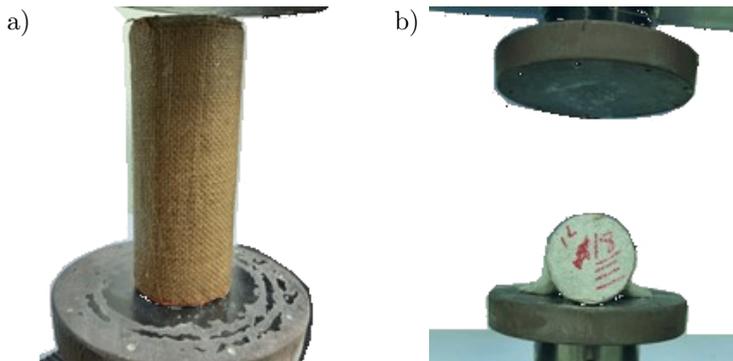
Specimen positioning on the test equipment: a) CT, b) ST.
